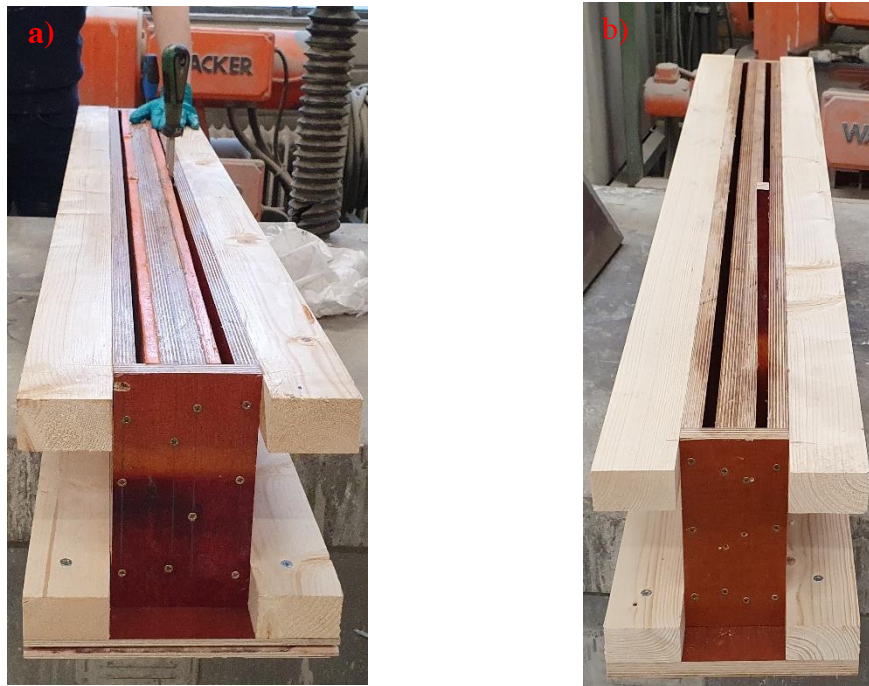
a) Mould for laminates with shear keys. b) Mould for smooth laminates.
